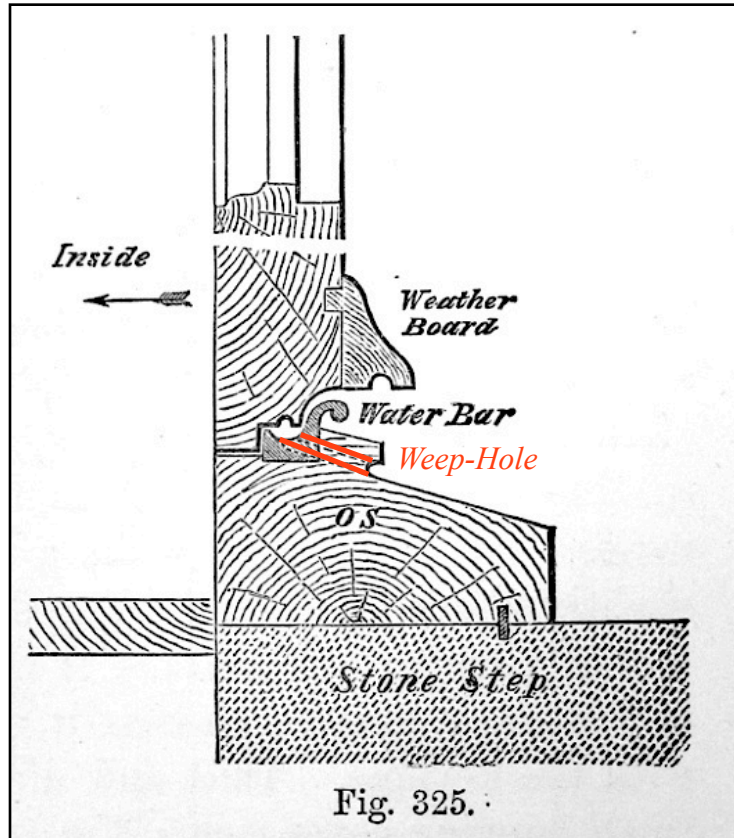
A drainage hole conveys water that collects in the water bar away from the base of the French door and the building.
